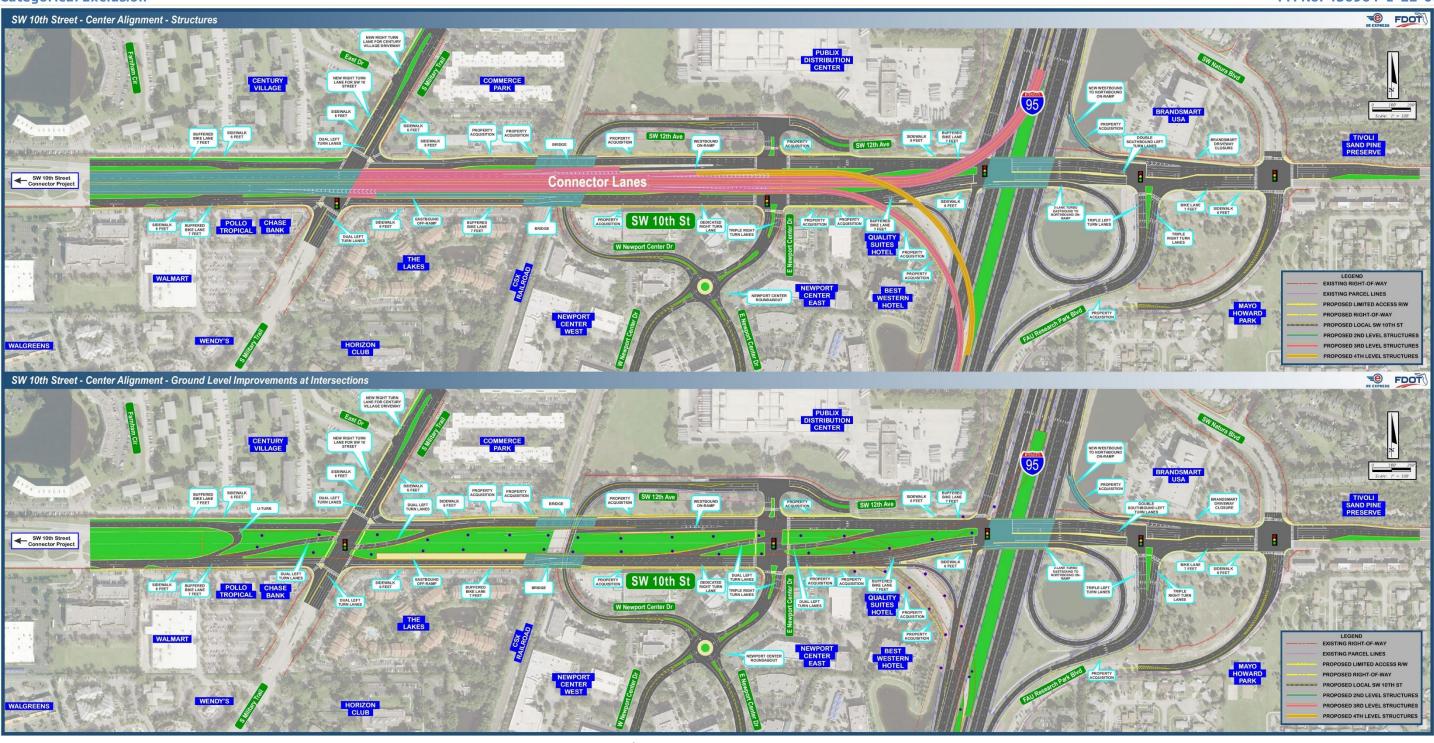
11: SW 10th Street – Center Alignment Concept Plan
